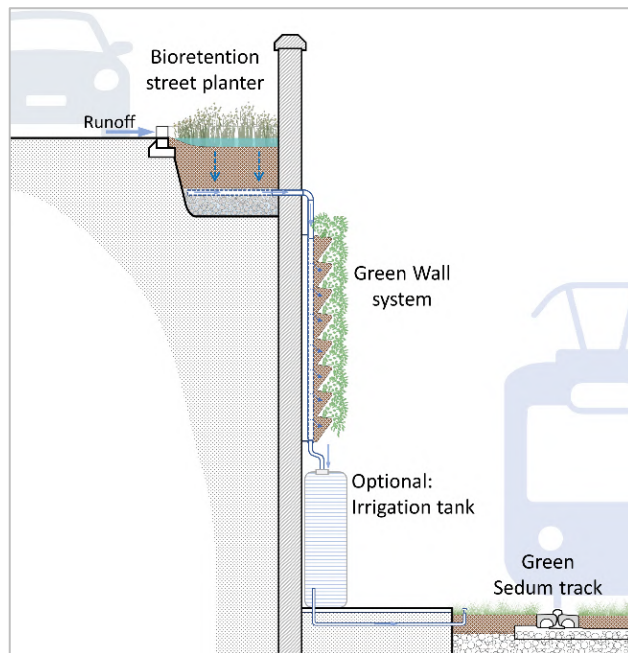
Proposed integrated concept of bioretention street planter, green wall and green track systems for lower tram profile
